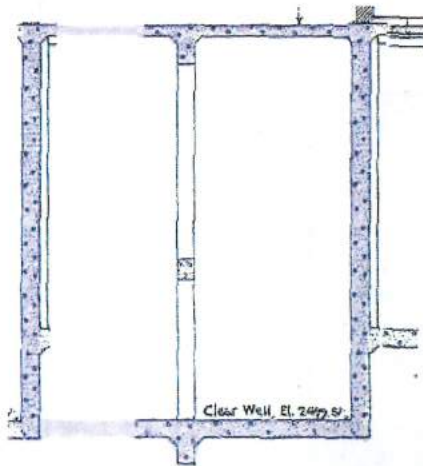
Section Through Clear Well Showing First Floor of Northwest Addition
